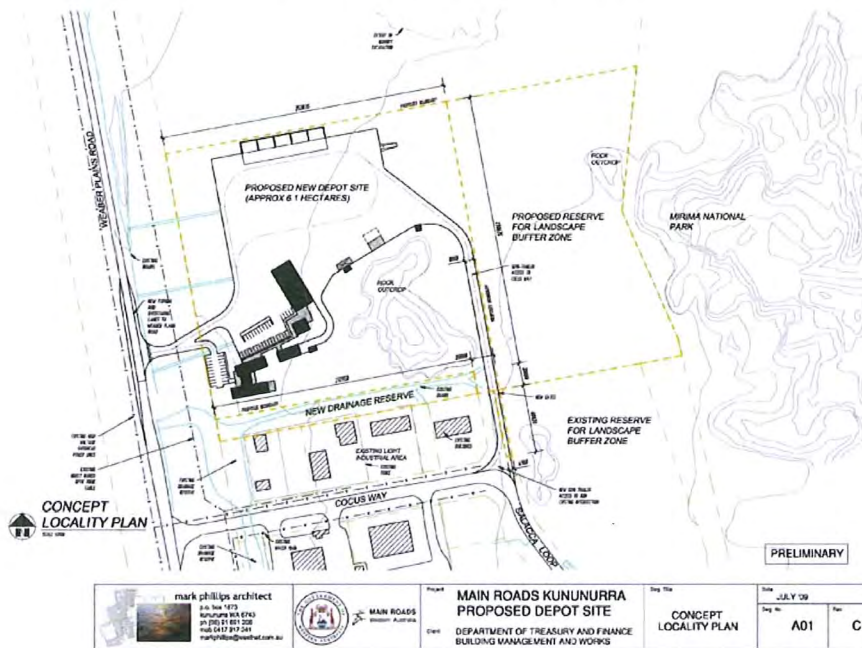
MRWA Kununurra Proposed Depot Site – Concept Locality Plan
